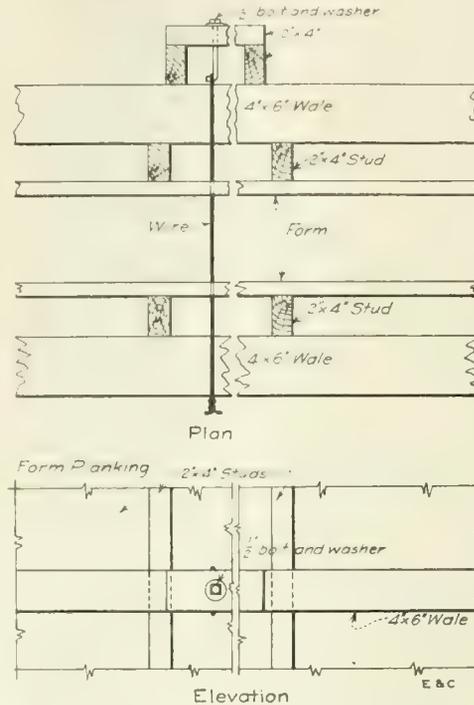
Details of a Simple Wire Tightener for Concrete Forms.
